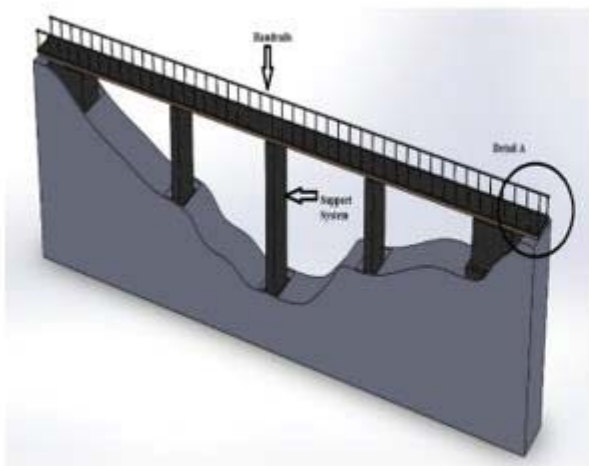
Proposed footbridge modelled with SOLIDWORKS.
